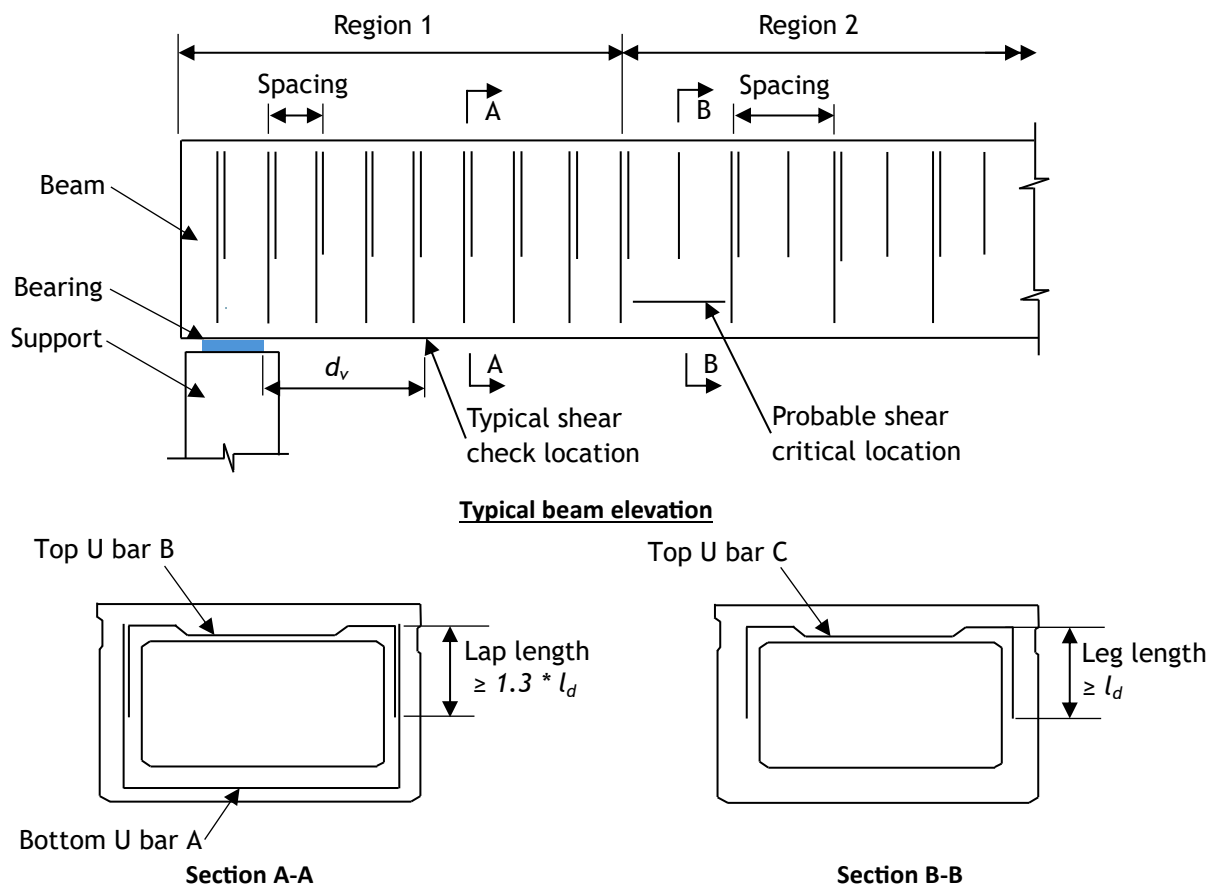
Typical beam section and elevation showing typical shear check location and probable critical point.
